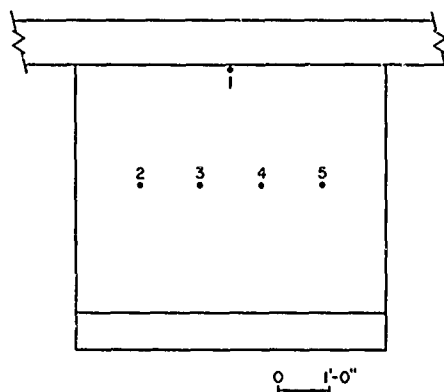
Film dosimeter locations in basement lean-to shelters in two-story houses; Stations 1-31.1 a-1, a-2, b-1, b-2.
